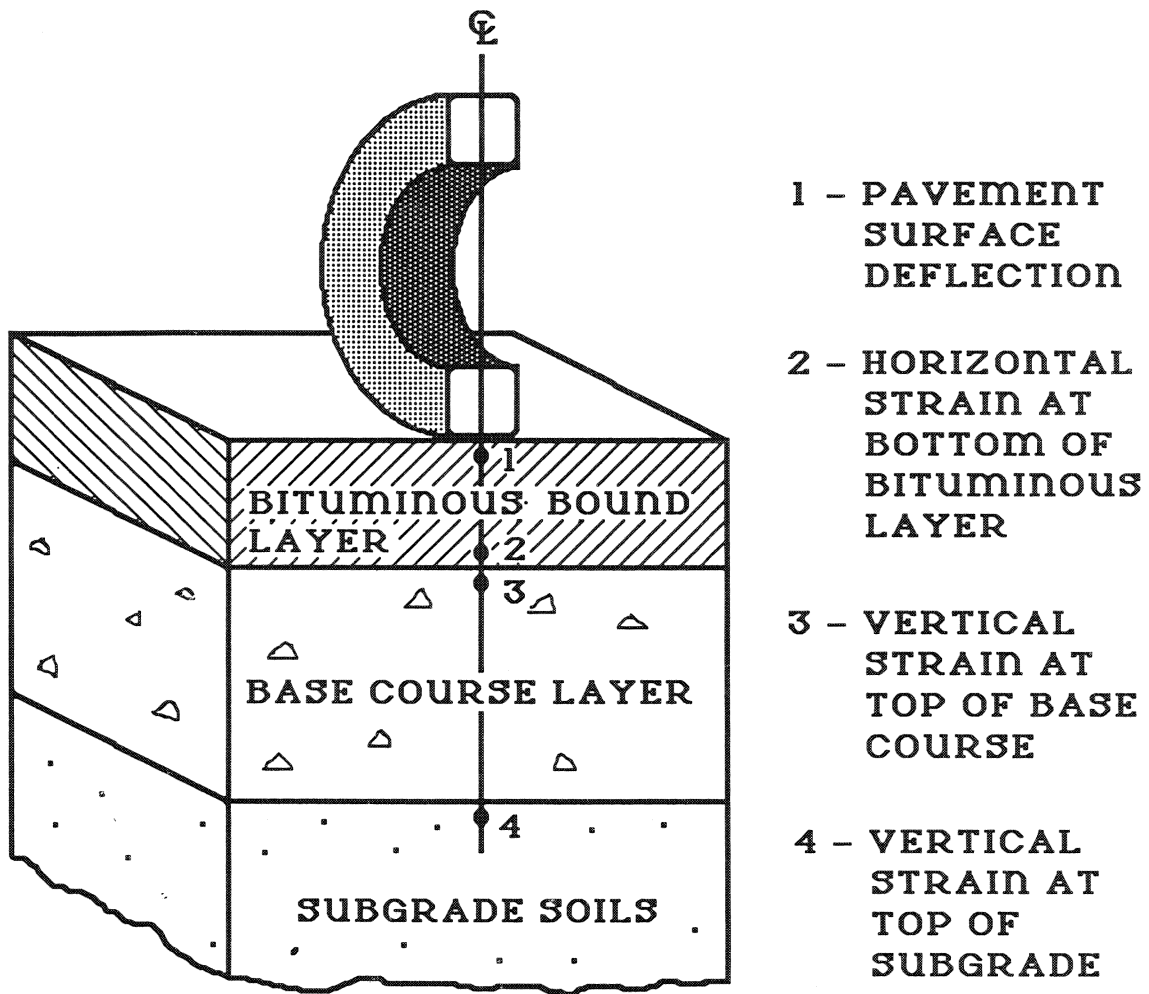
Pavement Response Locations Used in Evaluating Load Restrictions
